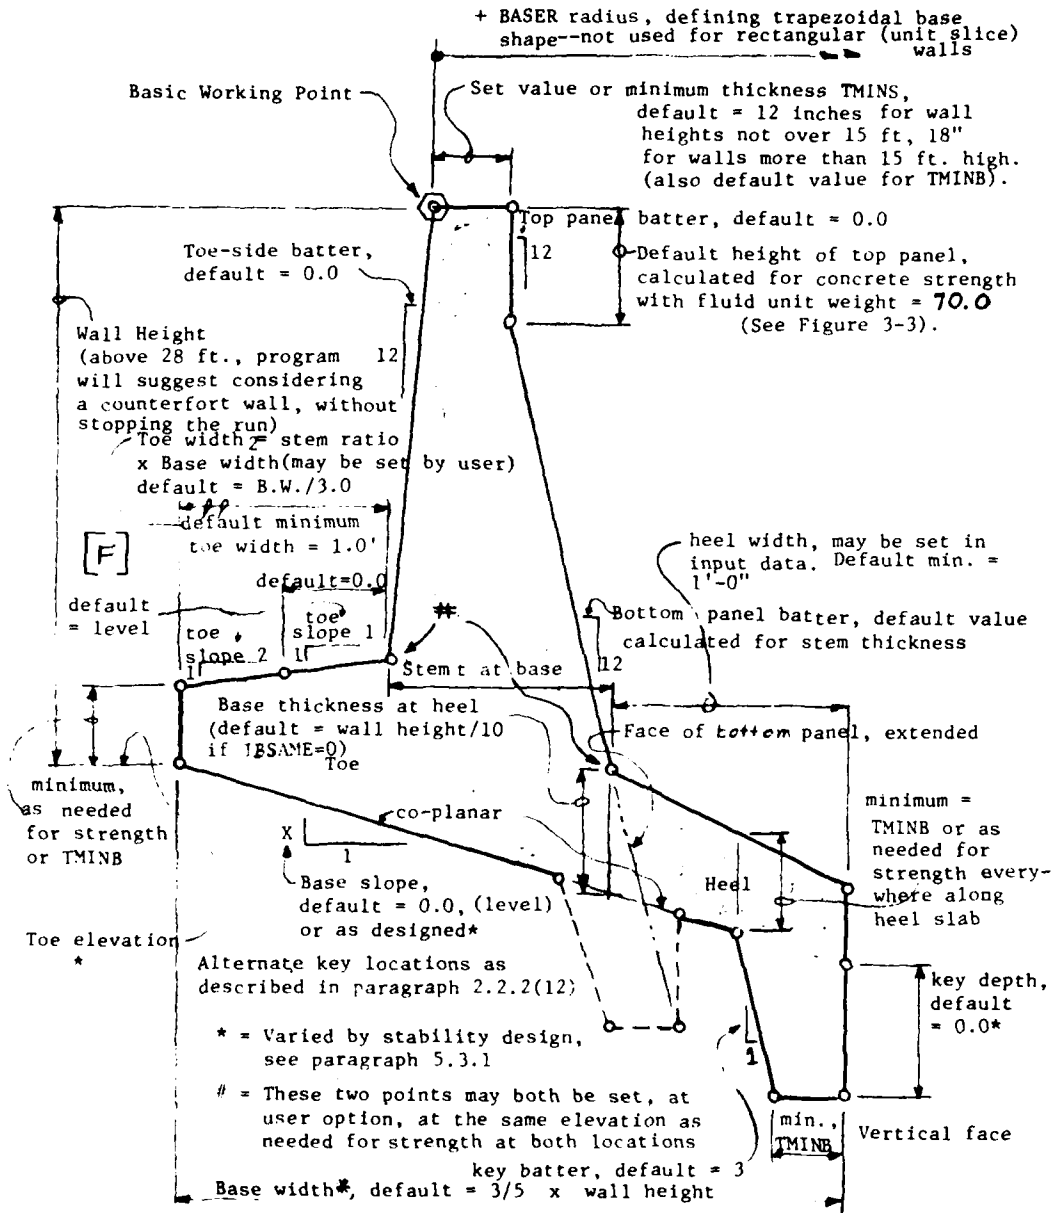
WALL CROSS SECTION SHOWING MAJOR VARIABLES
